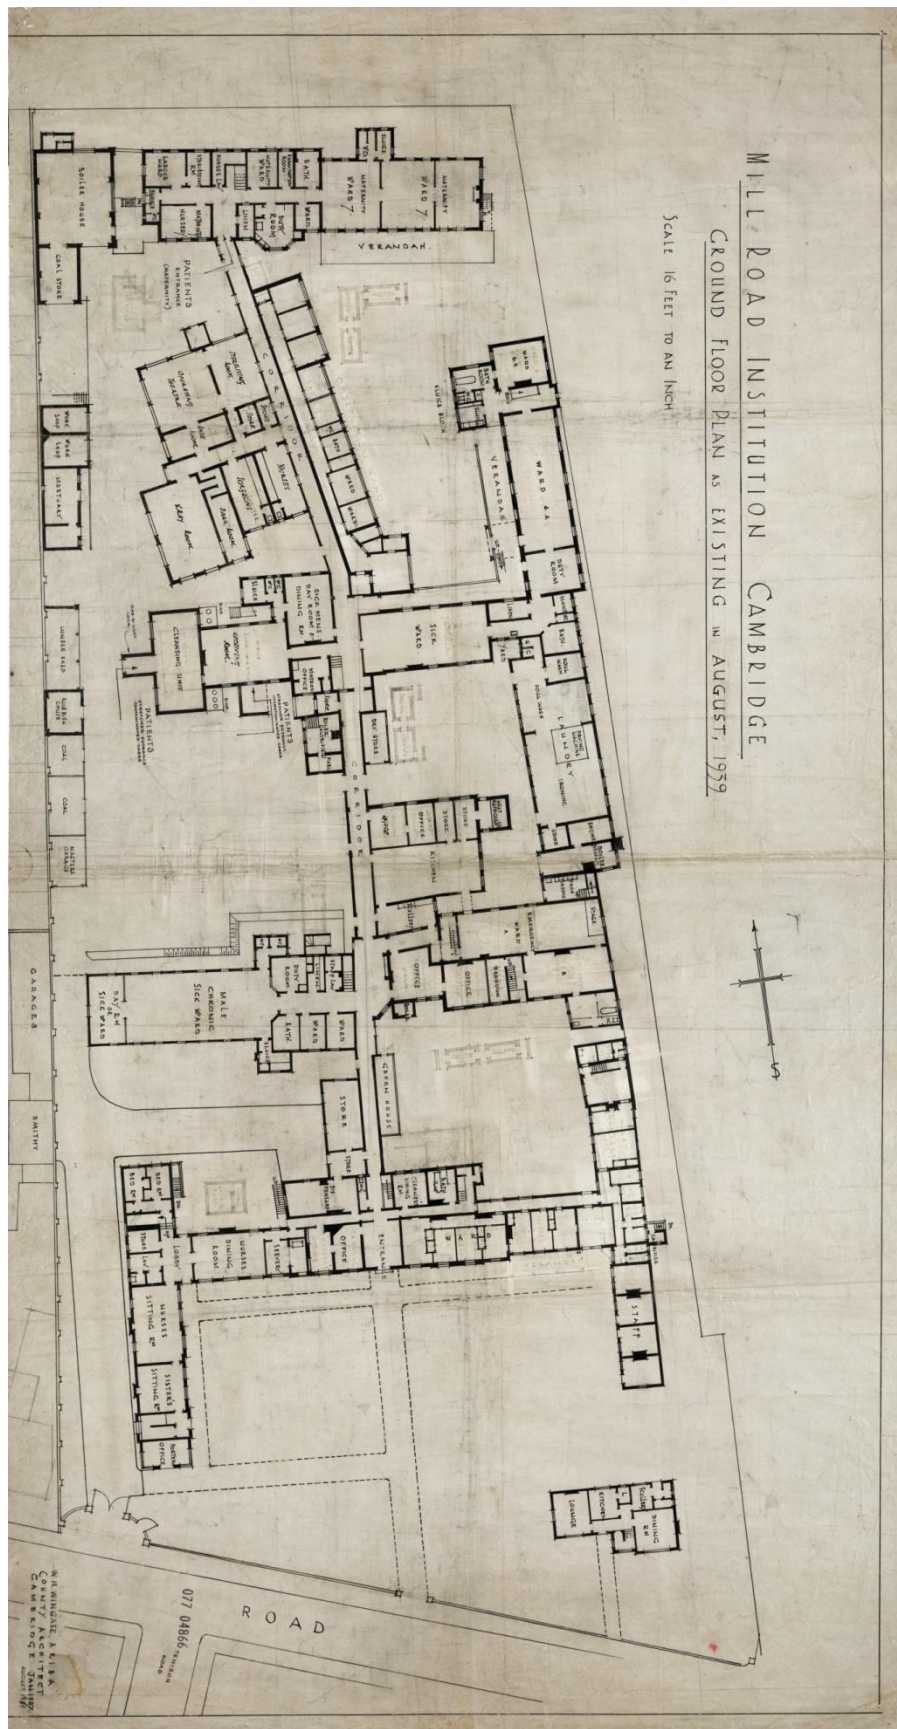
Ground-floor plan of the Infirmary, 1939 (CA: KCC7 Arch SS2 7.07704866)
